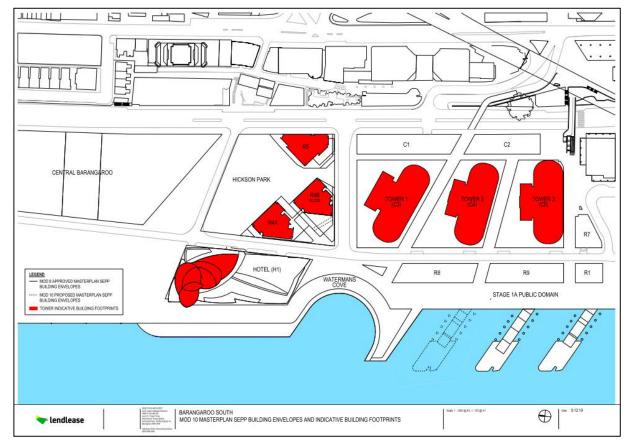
Stage 1B Buildings Site Location and Staging Plan
